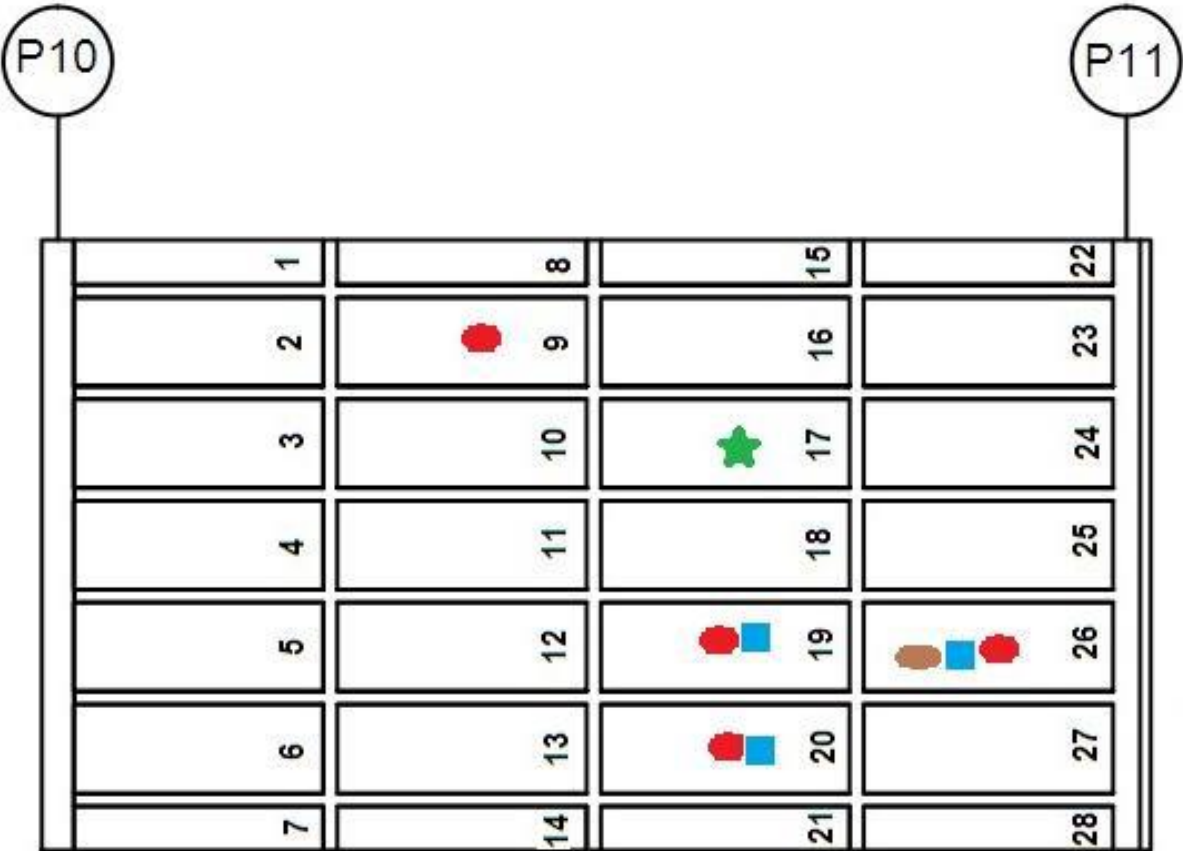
Test conducted at various locations between Pier P10 and Pier P11
